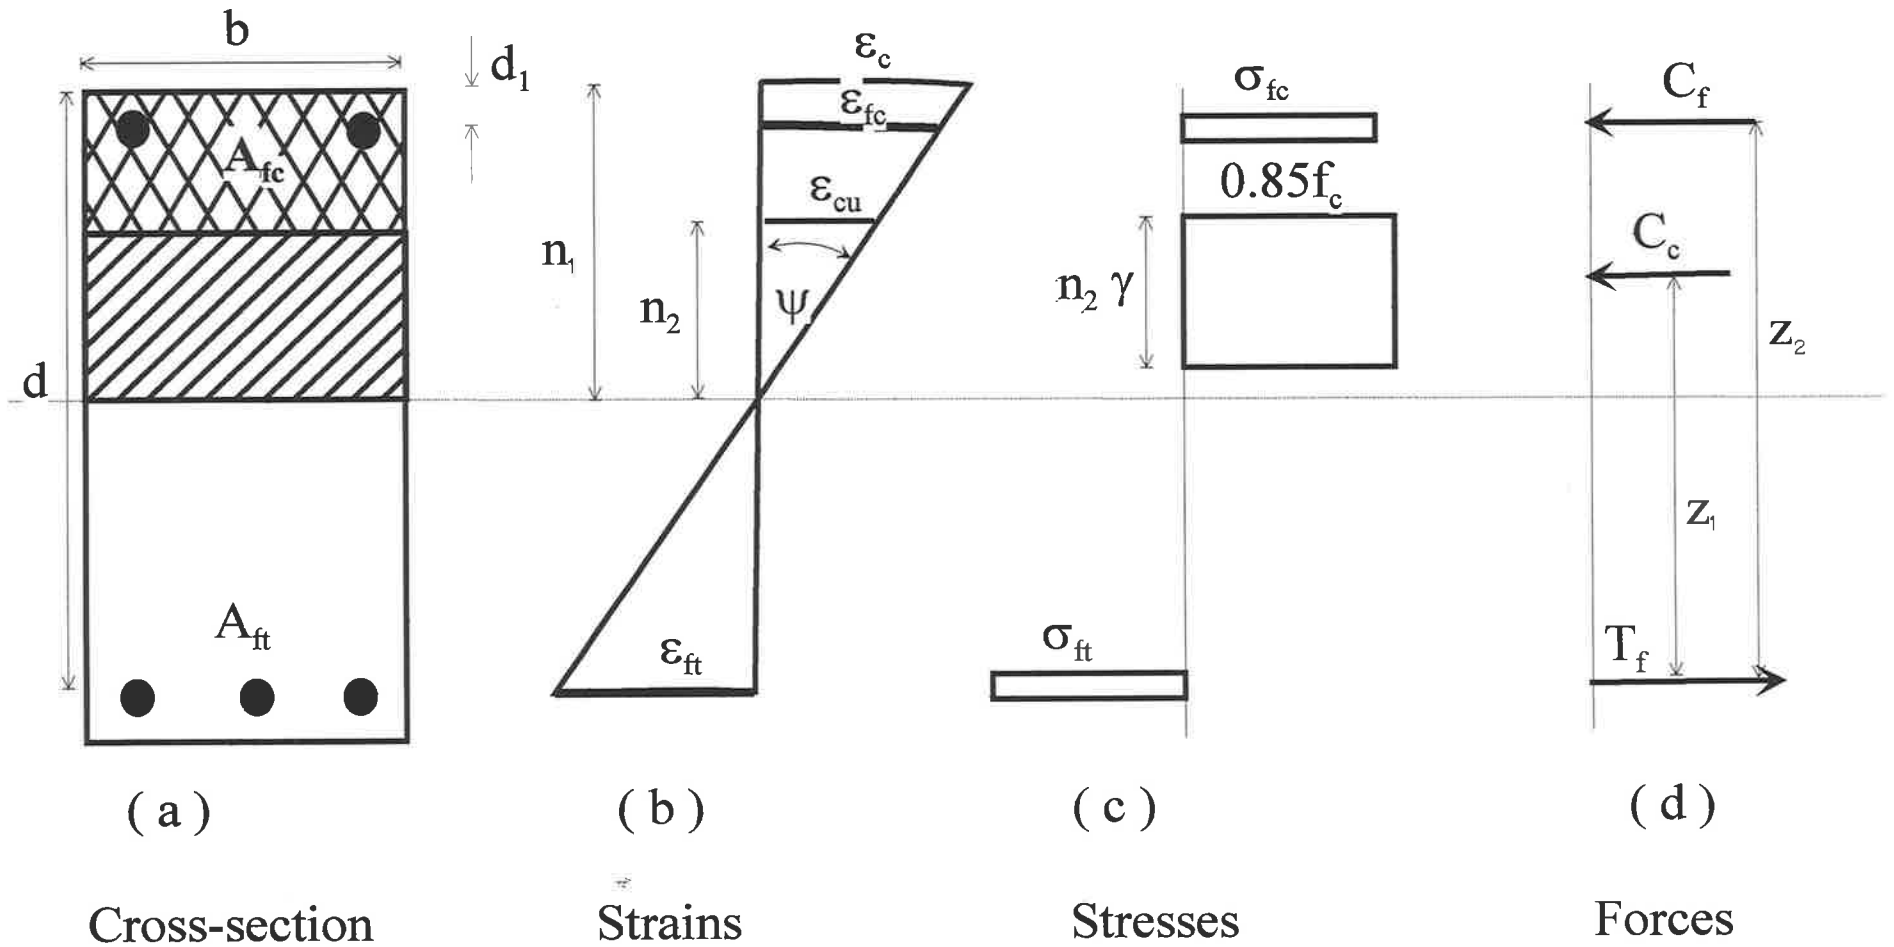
Doubly reinforced concrete beam with FRP reinforcing bars.
